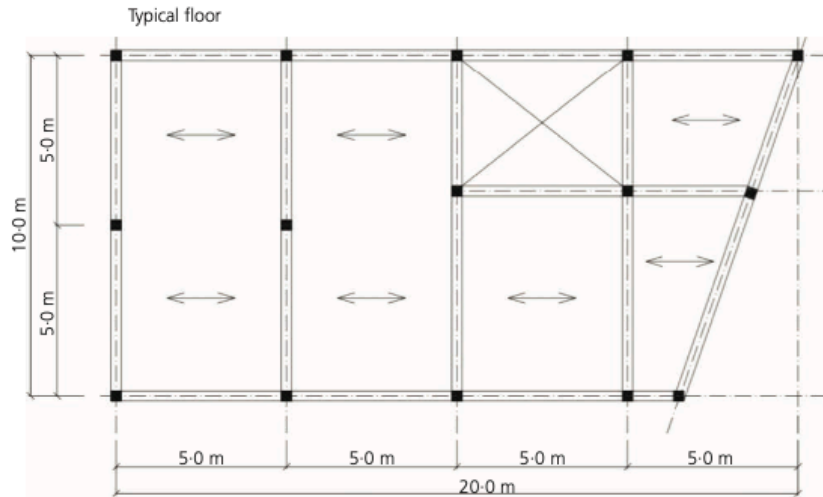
Ground plan of a typical floor of the subject of CS2 – a six-storey residential or office building
